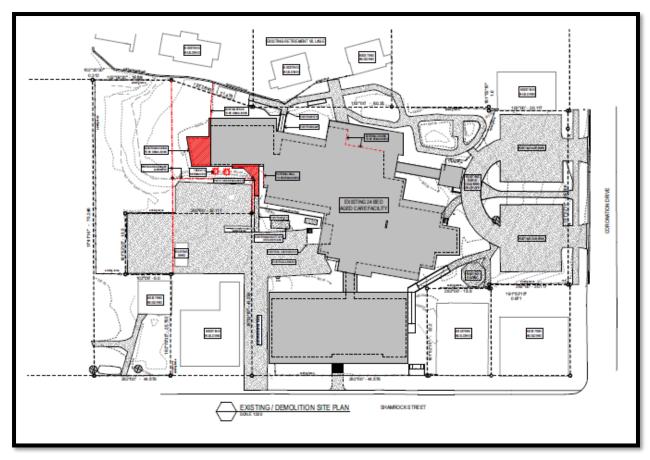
EXISTING / DEMOLITION SITE PLAN (Source: Extract from approved plans)
